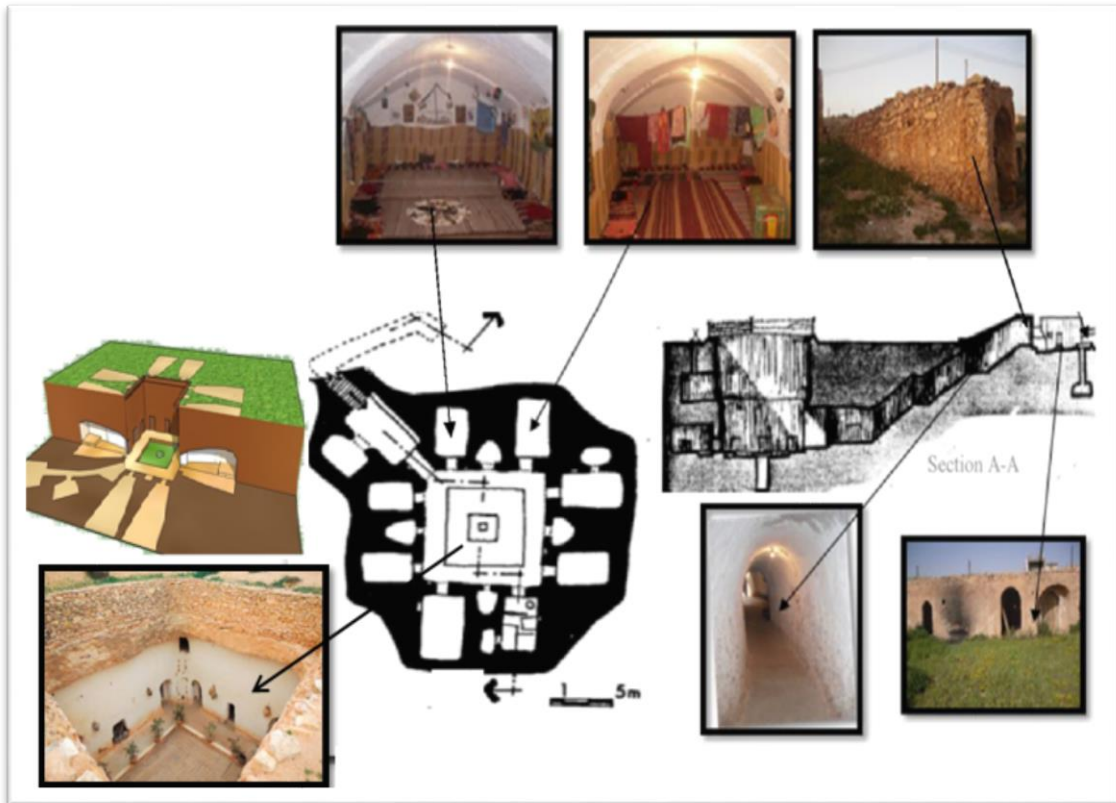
Plan, vertical section, and photos of an underground dwelling in Gharyan. (Photos by author 2019)
